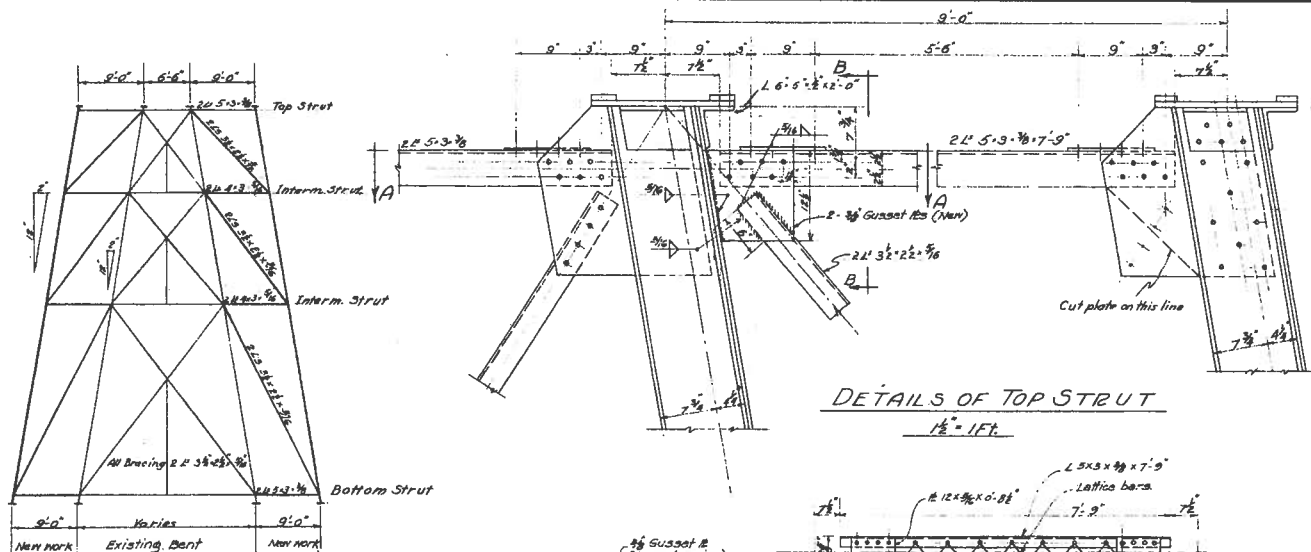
DETAIL OF CROSS FRAME CONNECTION AT ENDS OF BRIDGE
